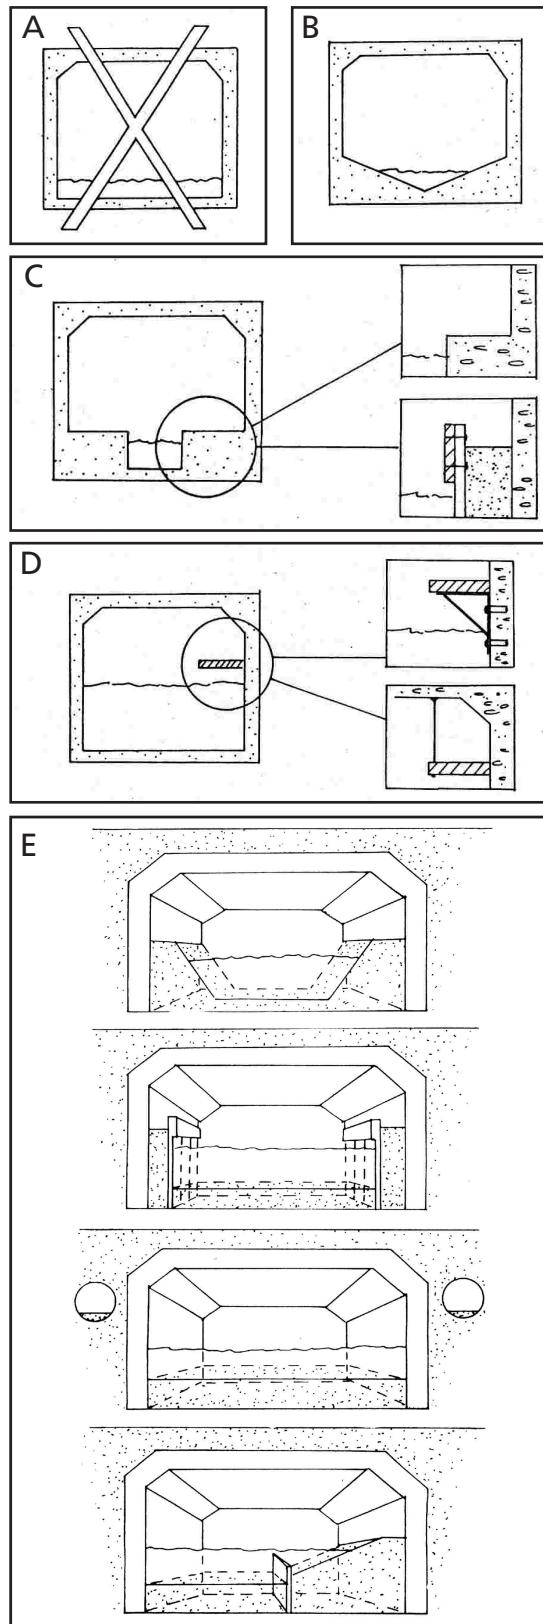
Small terrestrial animals can use culverts, if dry walkways are provided. A: not suited for terrestrial animals, because water covers the whole bottom part of the culvert. B and C: prefabricated concrete walkways above the water level. D: a wooden board above the water level, fixed to the side wall. E: design perspectives.
